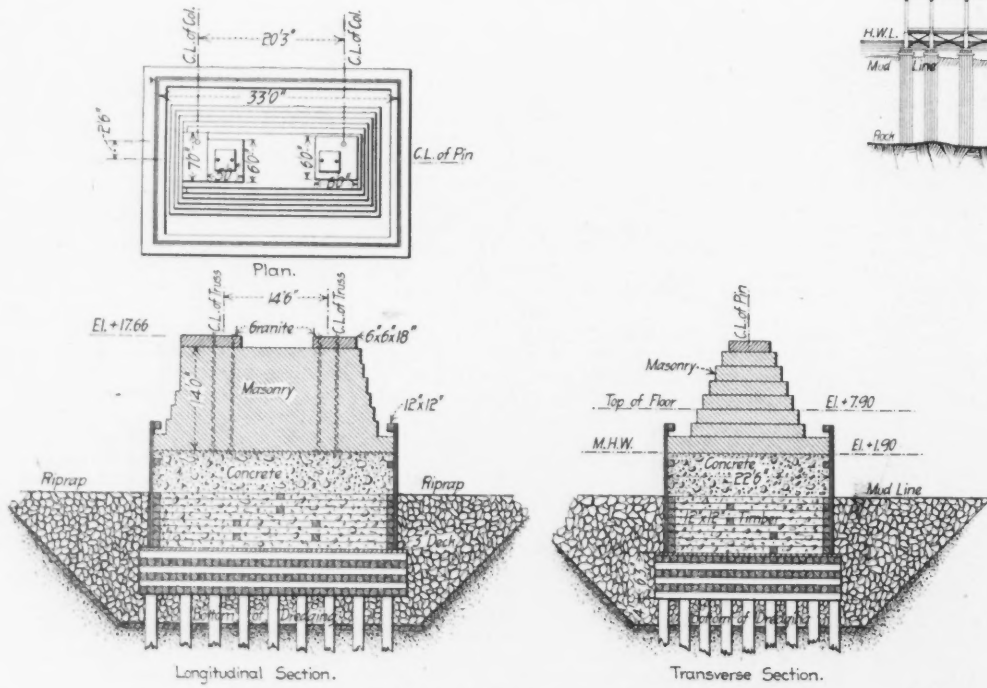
FOUNDATION FOR PIERS UNDER MAIN TRUSSES.
